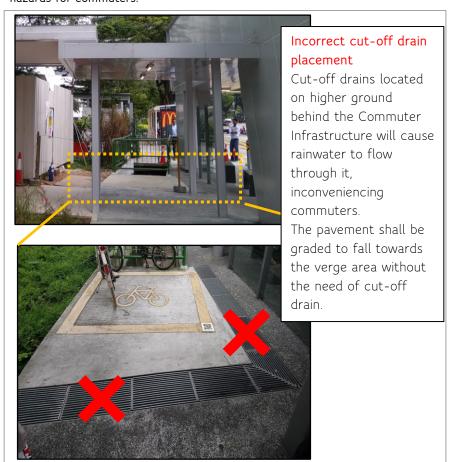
Common Mistake: No cut-off drains shall be proposed within the Road Reserve
